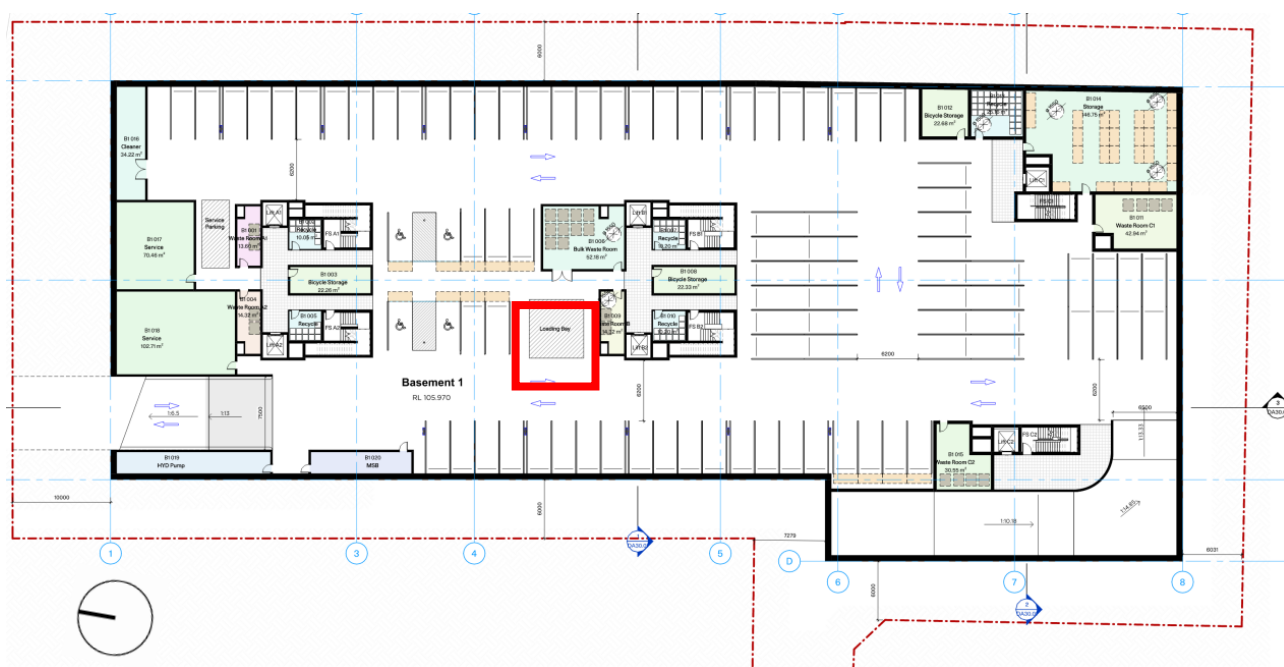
Proposed Basement 1, with waste collection and loading area identified in red(Source: PMDL Architects)
